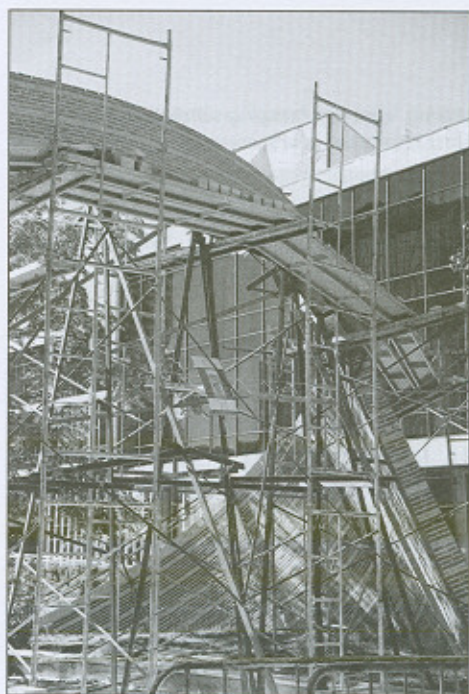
Completed and propped Arch awaiting final setting prior to striking.
